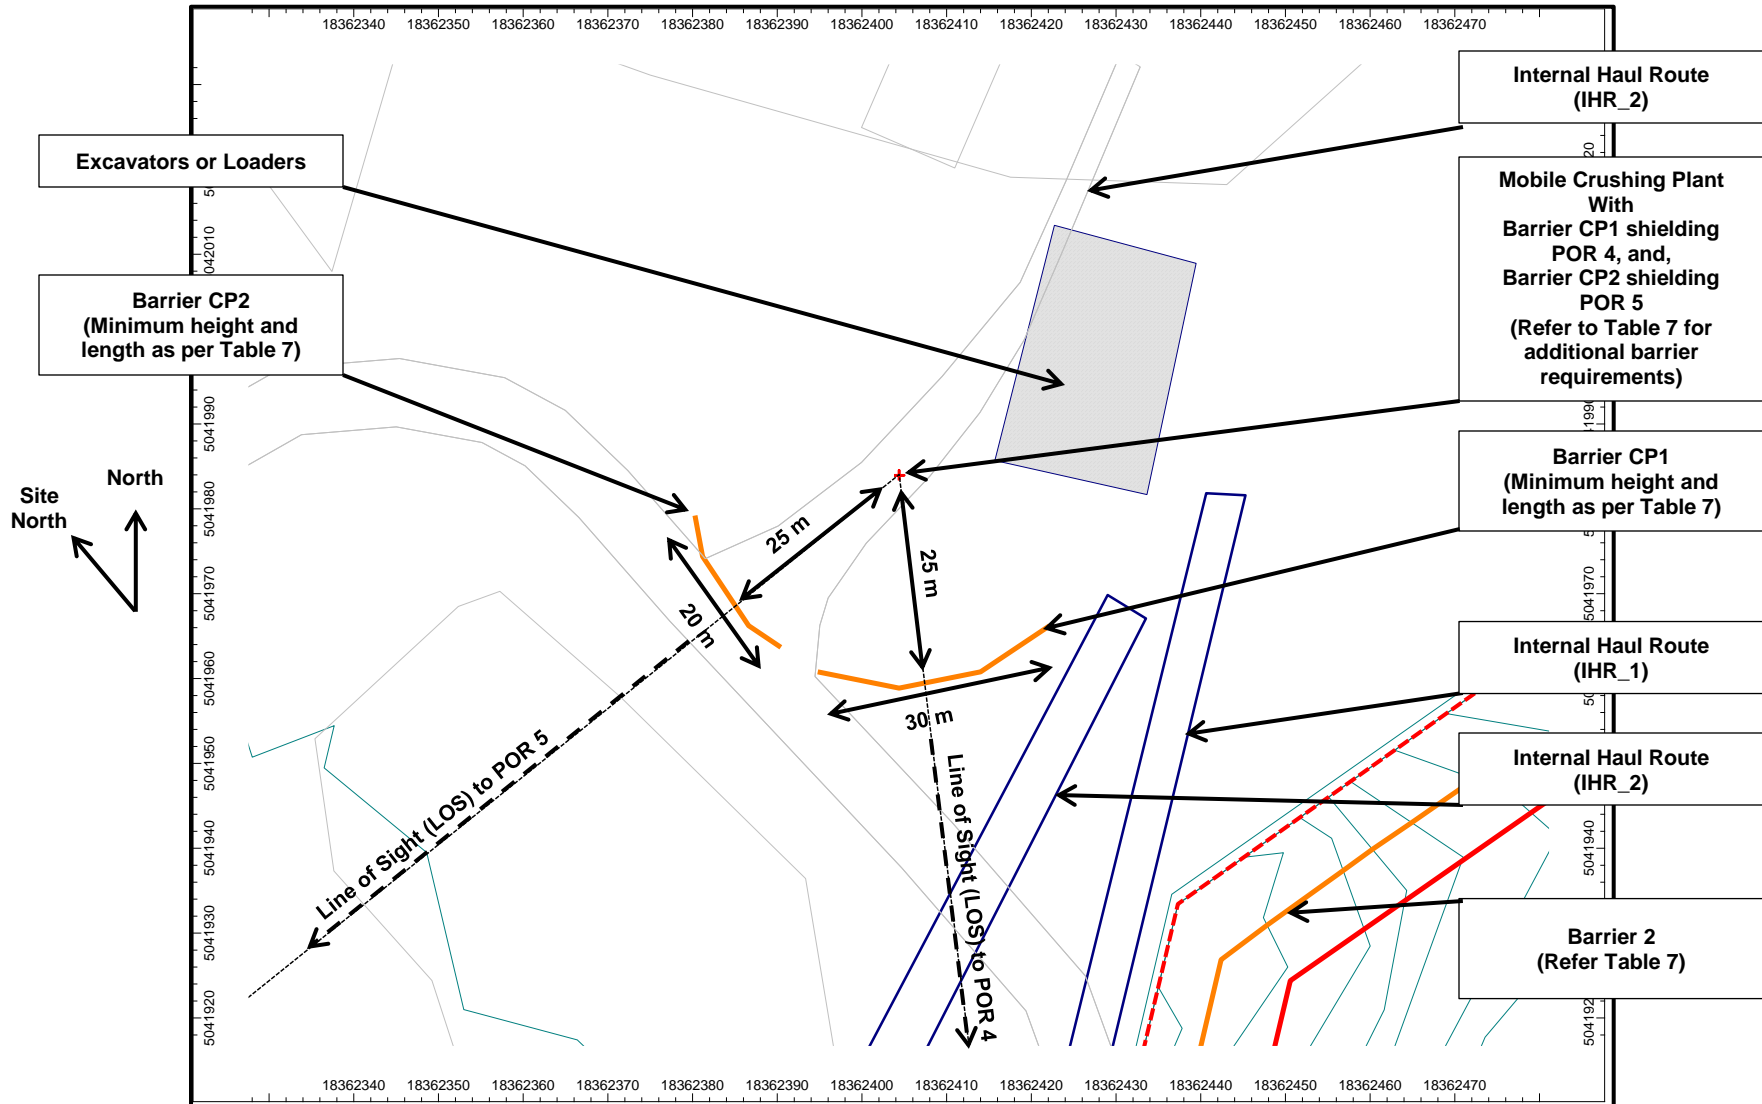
Detail plan at Mobile Crushing Plant showing Barrier CP1 and CP2
